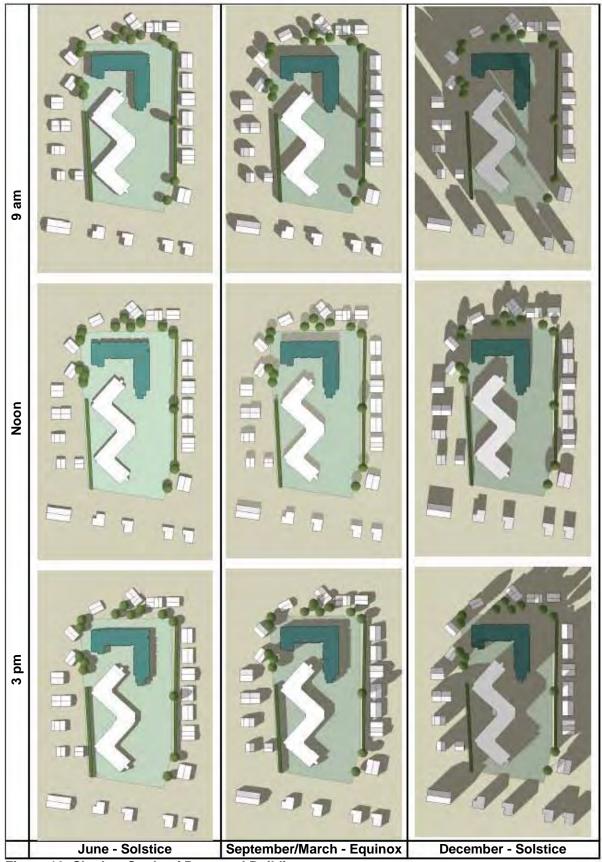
Shadow Study of Proposed Building (Provided by Number Ten Architectural Group)
